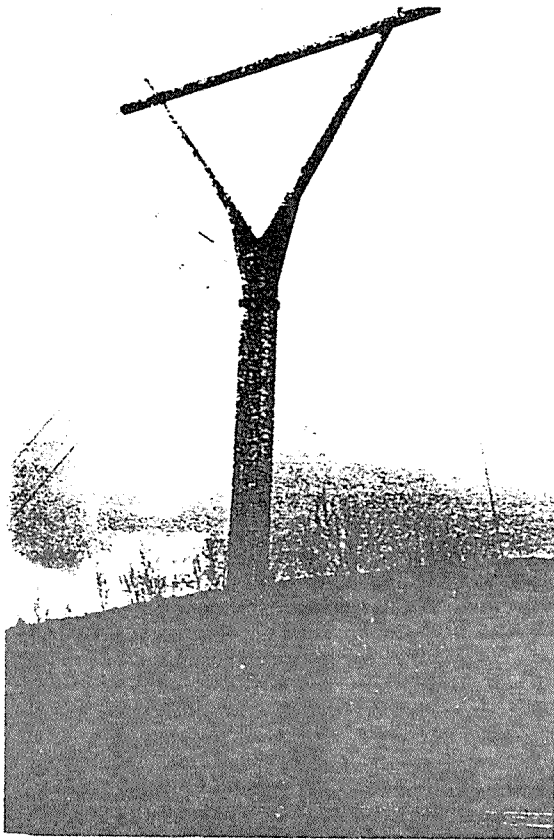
Full-scale test of LVL Y-tower at the Trus Joist Corporation.
